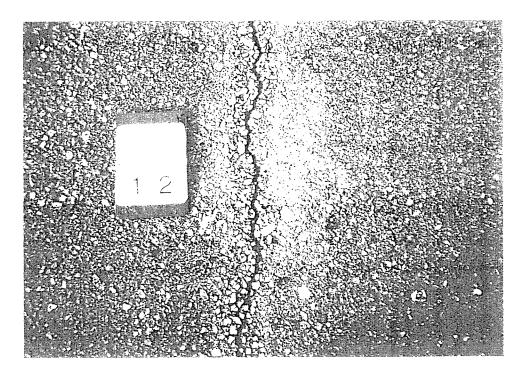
Crack of Photo 3.21 After Vacuum Blasting
